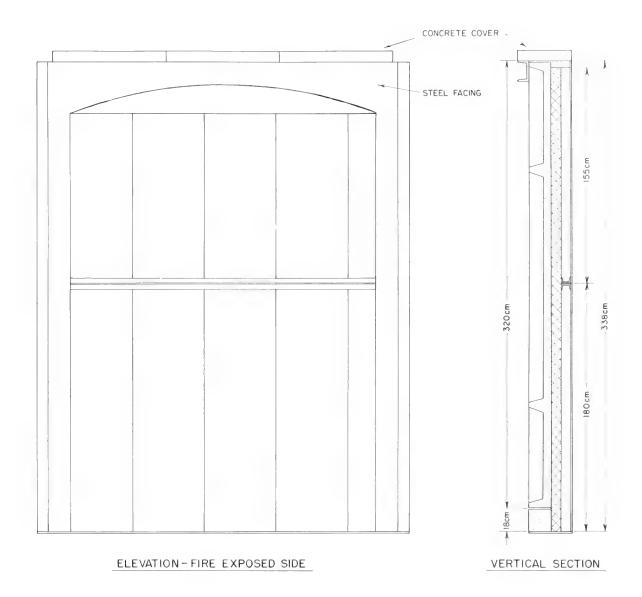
FIG. I CONSTRUCTION DETAILS OF TEST PANEL NO. I
